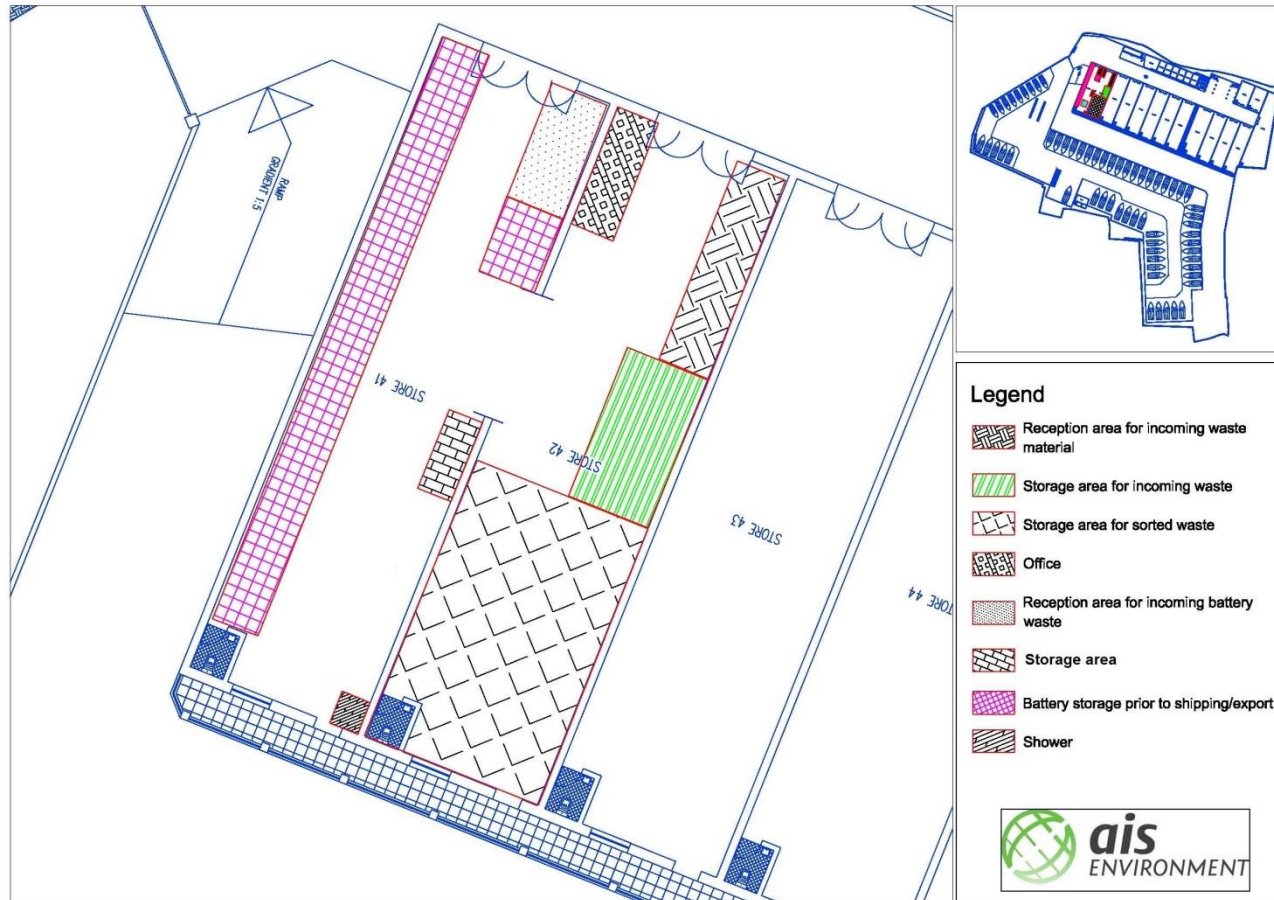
Site plan showing location and nature of activities that occur at the facility within warehouses 41 & 42
